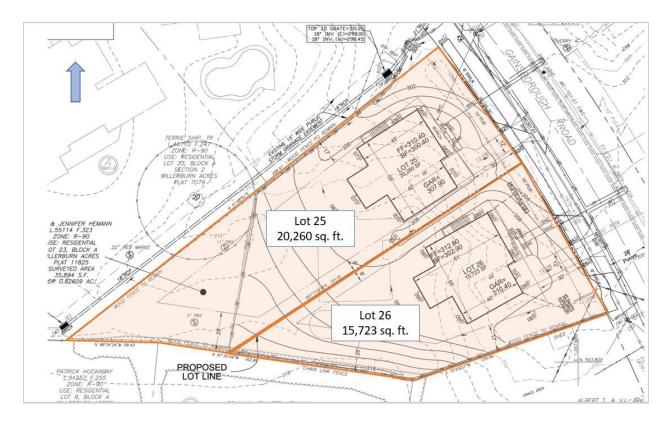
Proposed Administrative Subdivision Plan No. 620220010
